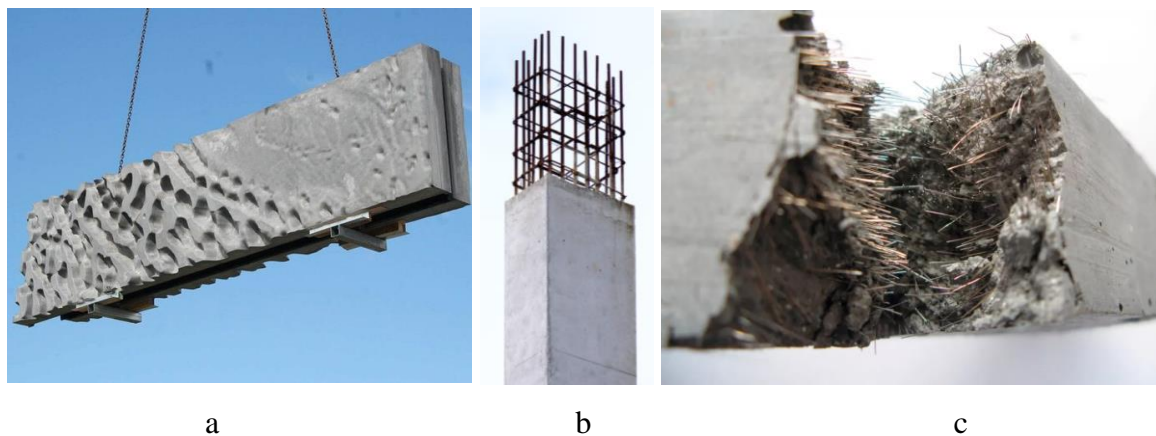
Precast concrete (a) (URL-23), Reinforced cement concrete (b) (URL-24), Fiber reinforced concrete (c) (URL-25)
